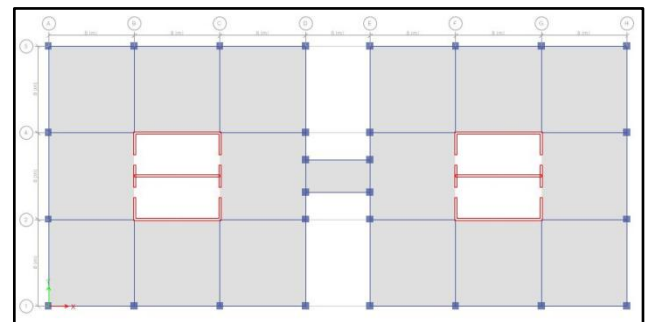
PLAN VIEW OF THE BUILDING WITH 6m SPAN CONNECTING CORRIDOR
